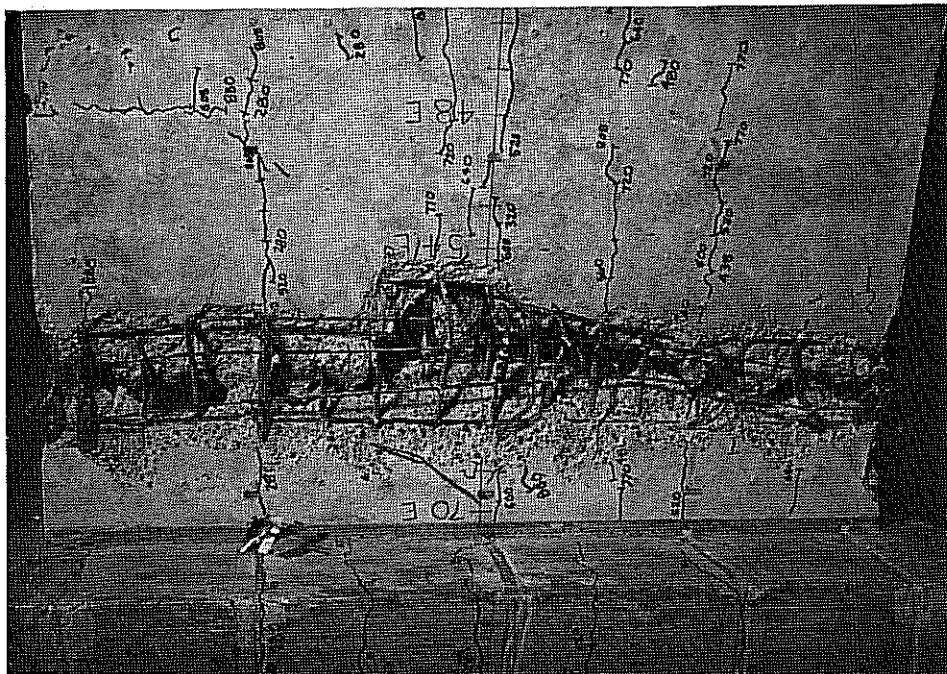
Specimen 3M14 Compression Flange Close-Up
